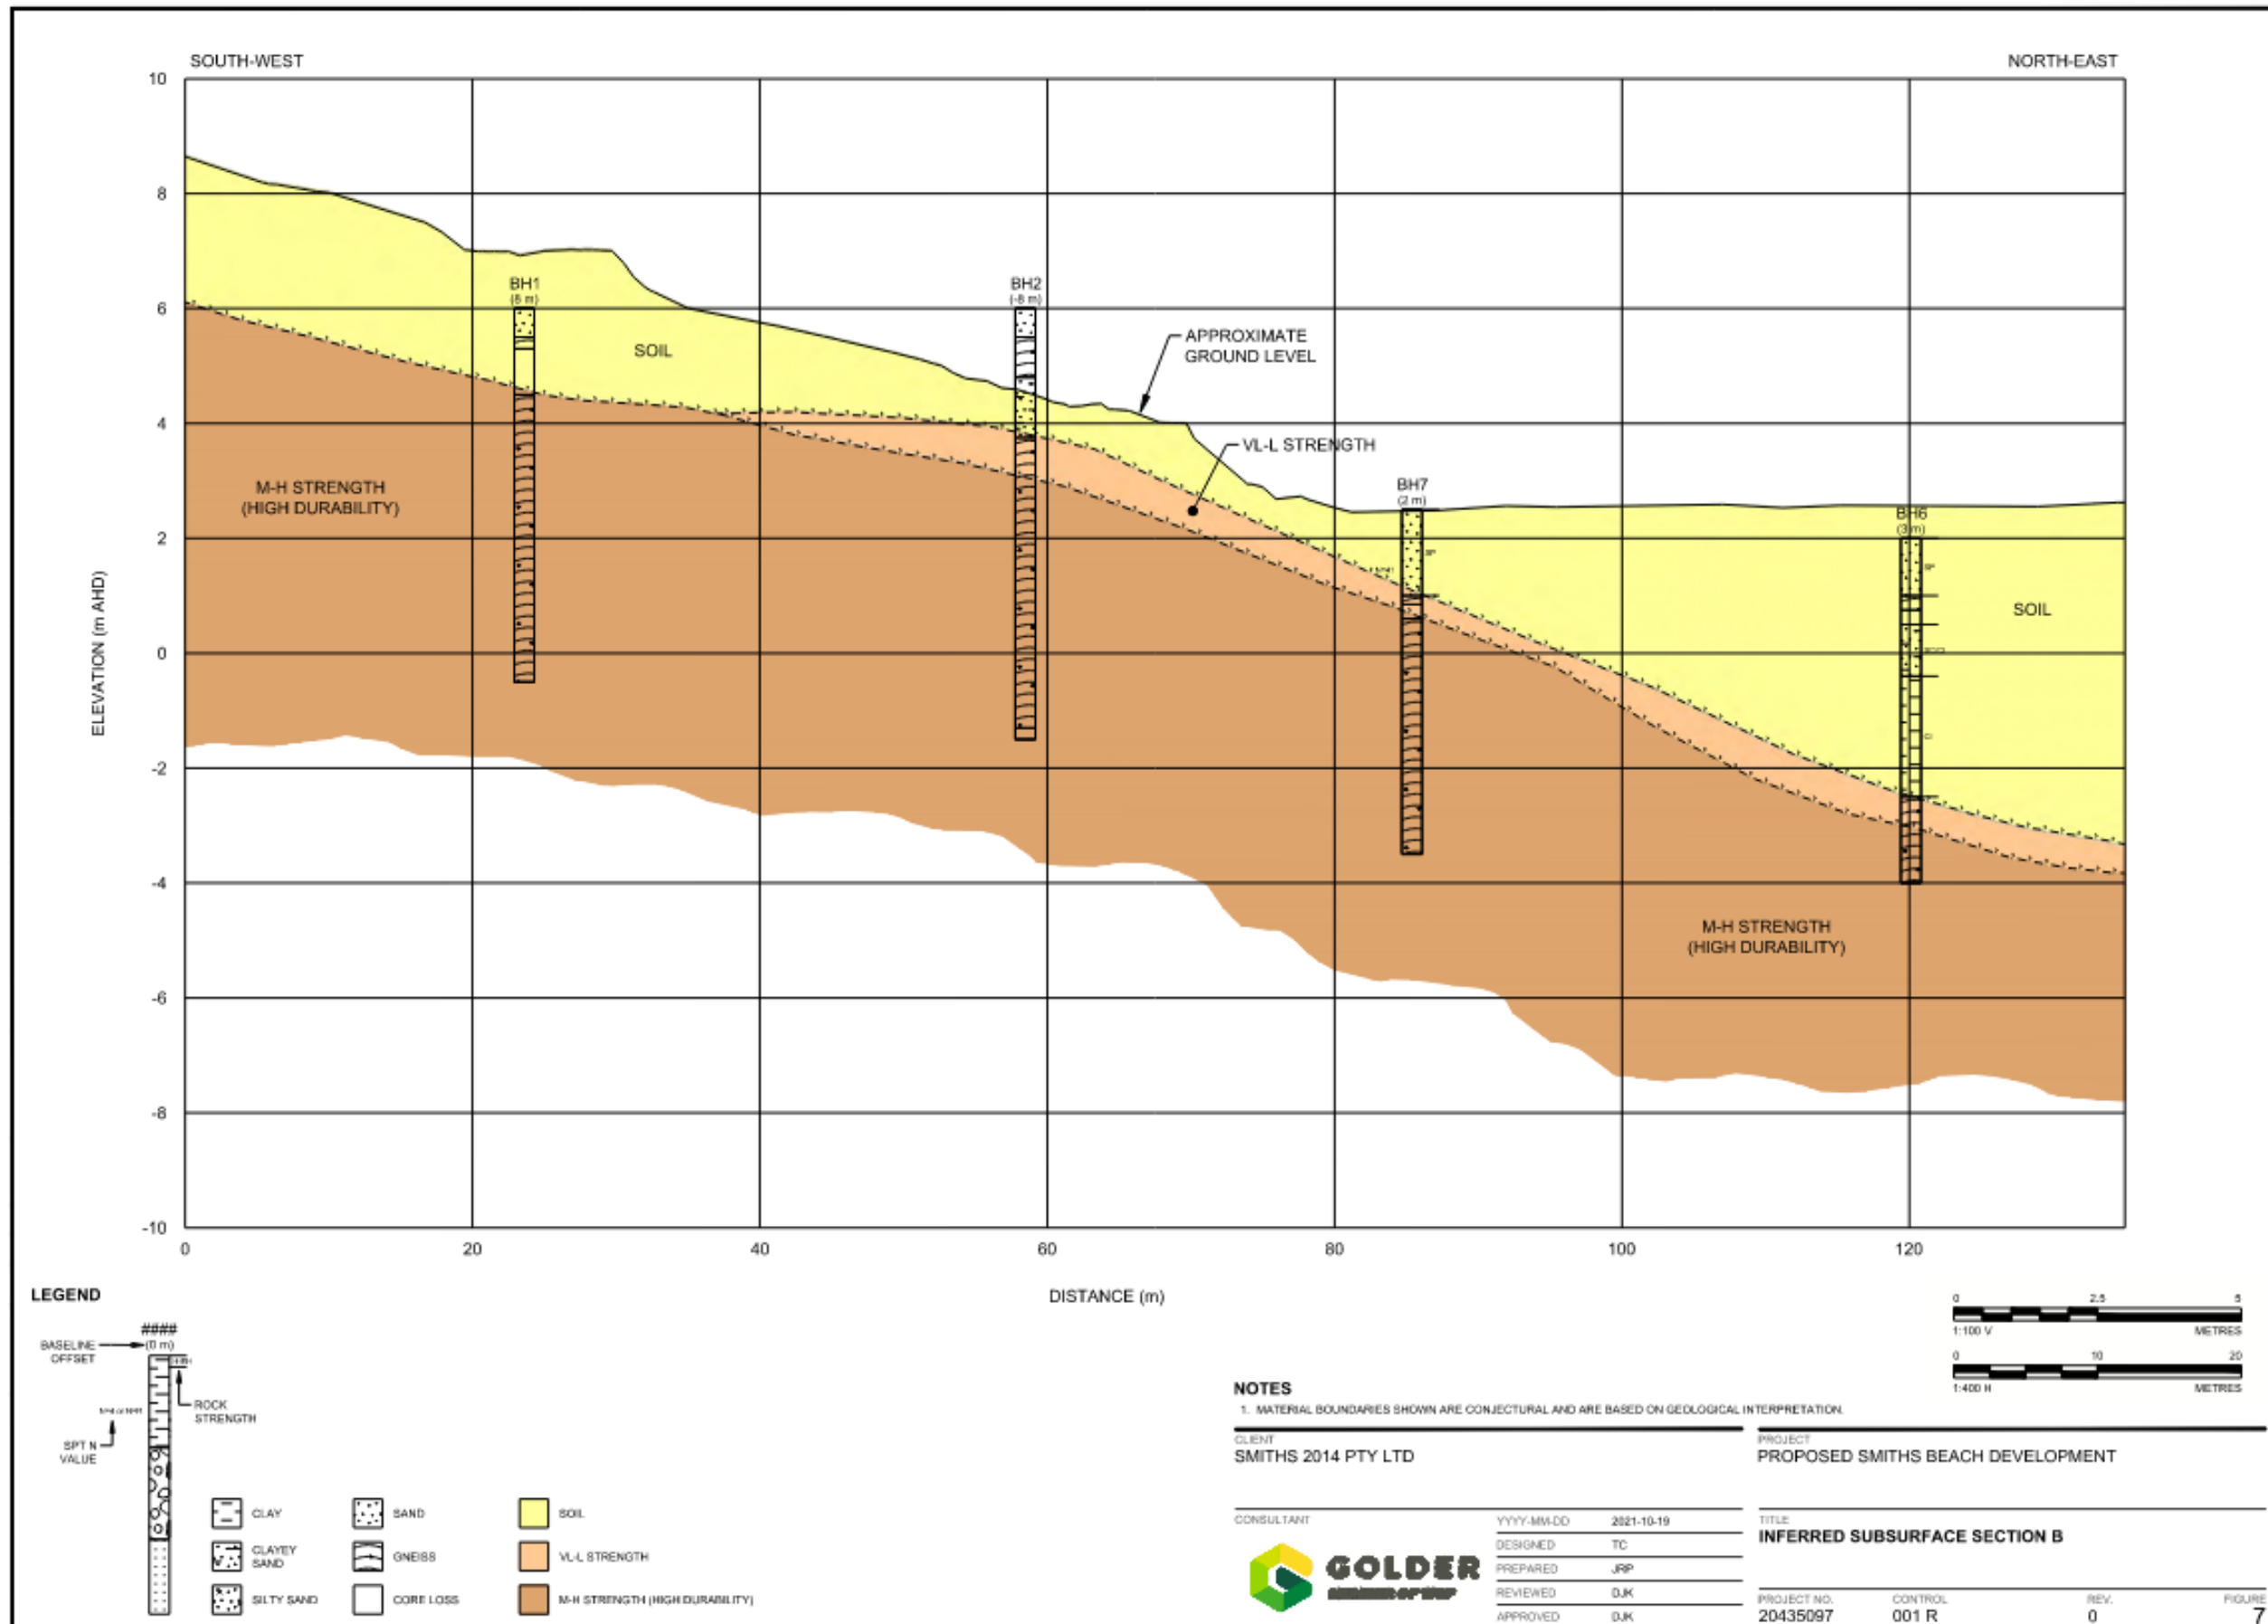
Inferred Rock Surface Elevation – Section B (Golders, 2021)
